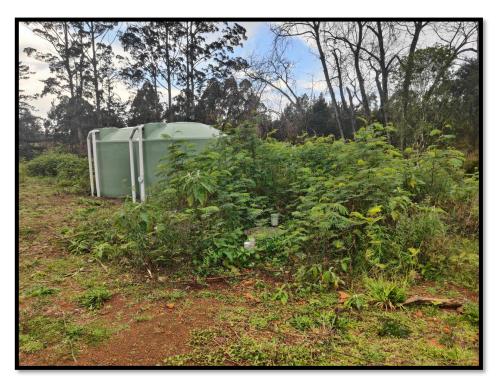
Existing dwelling water tanks and wastewater disposal system
